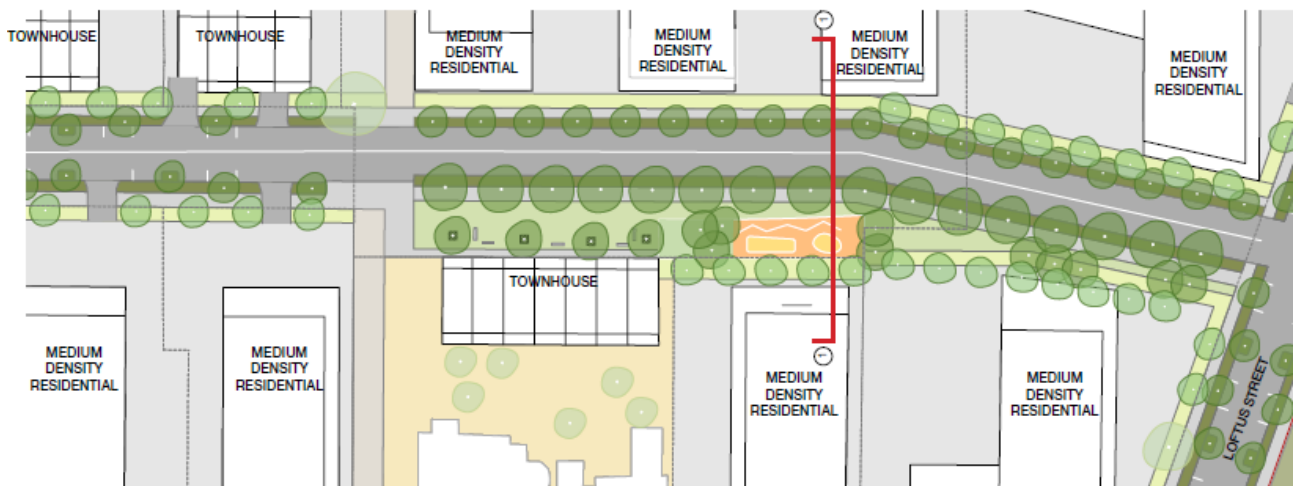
Moreton Street road corridor extension and linear park (PRCUTS Stage2 Public Domain Plan)
